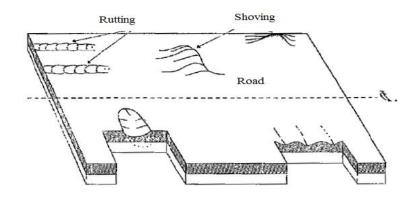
Pavement deformation Source: (Hye, 1992)
